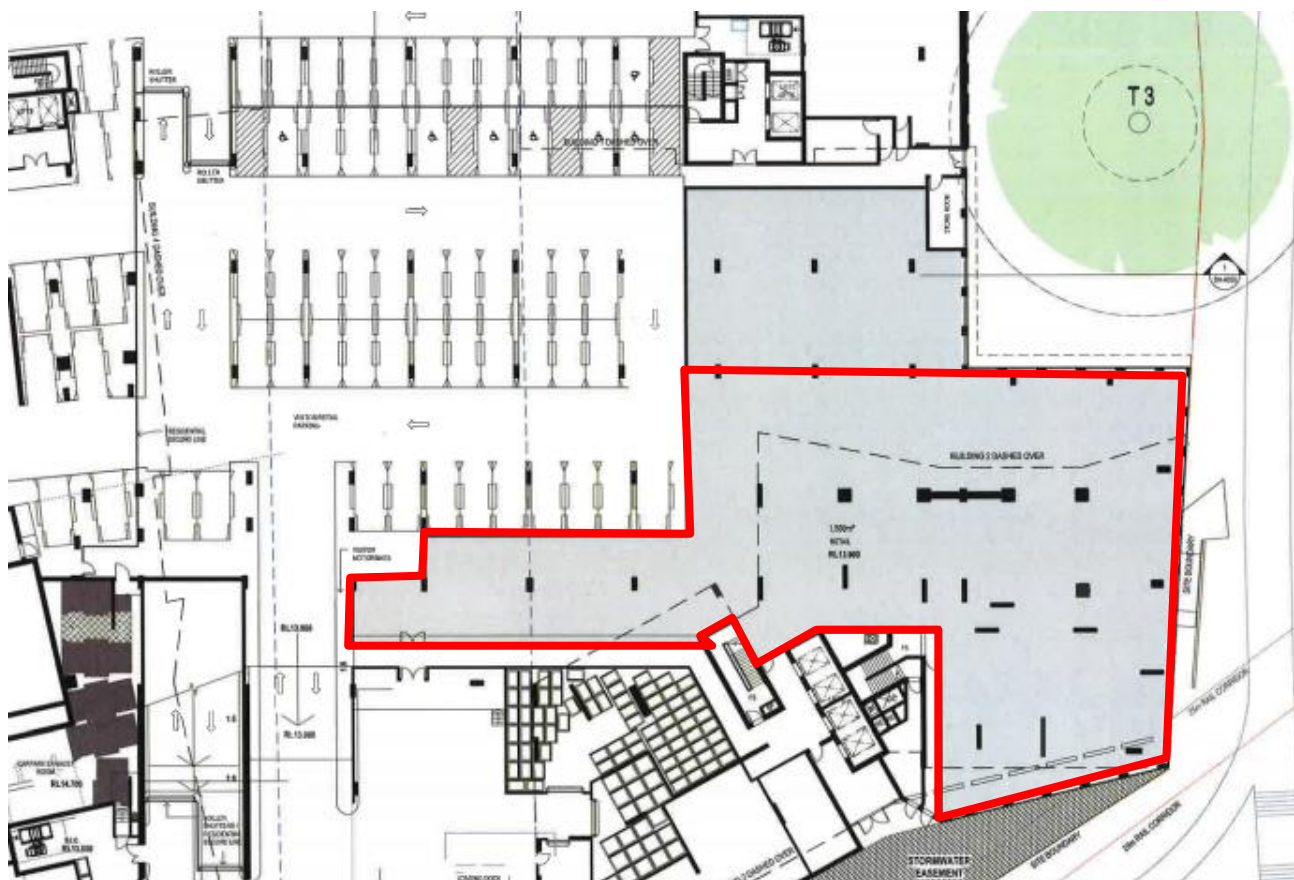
Location of the subject site outlined in red comprising retail floorplate on the ground floor
